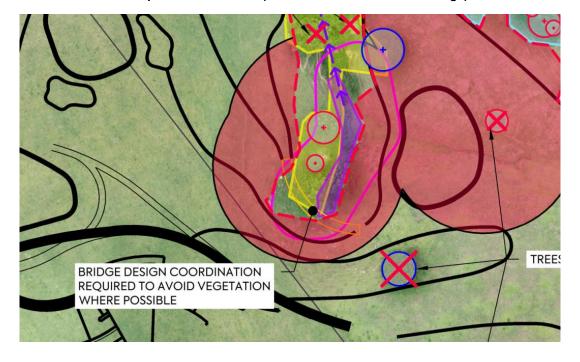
Proposed Bridge Location Show above adjacent to G28
